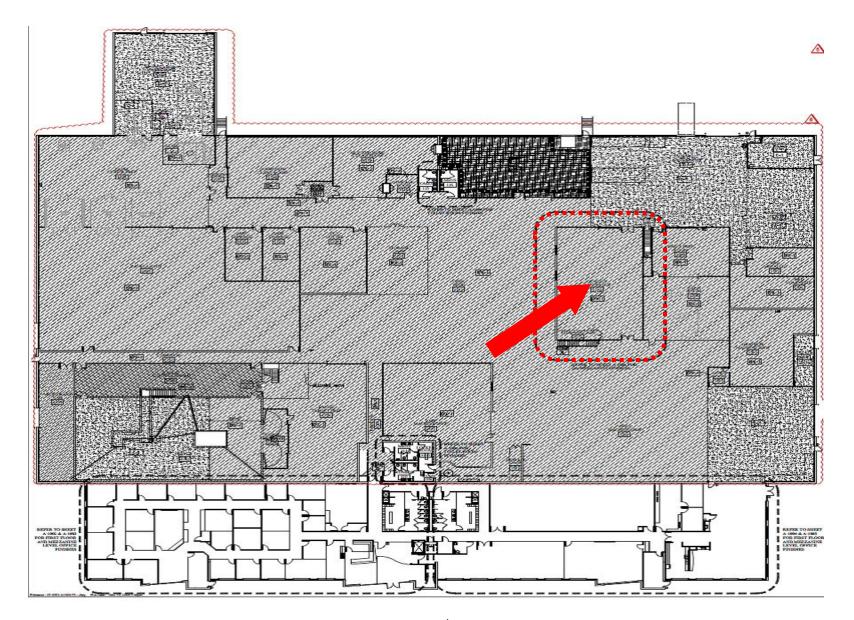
ATK Dayton Facility, 2<sup>nd</sup> Floor Mezzanine (Desired Test Area)
